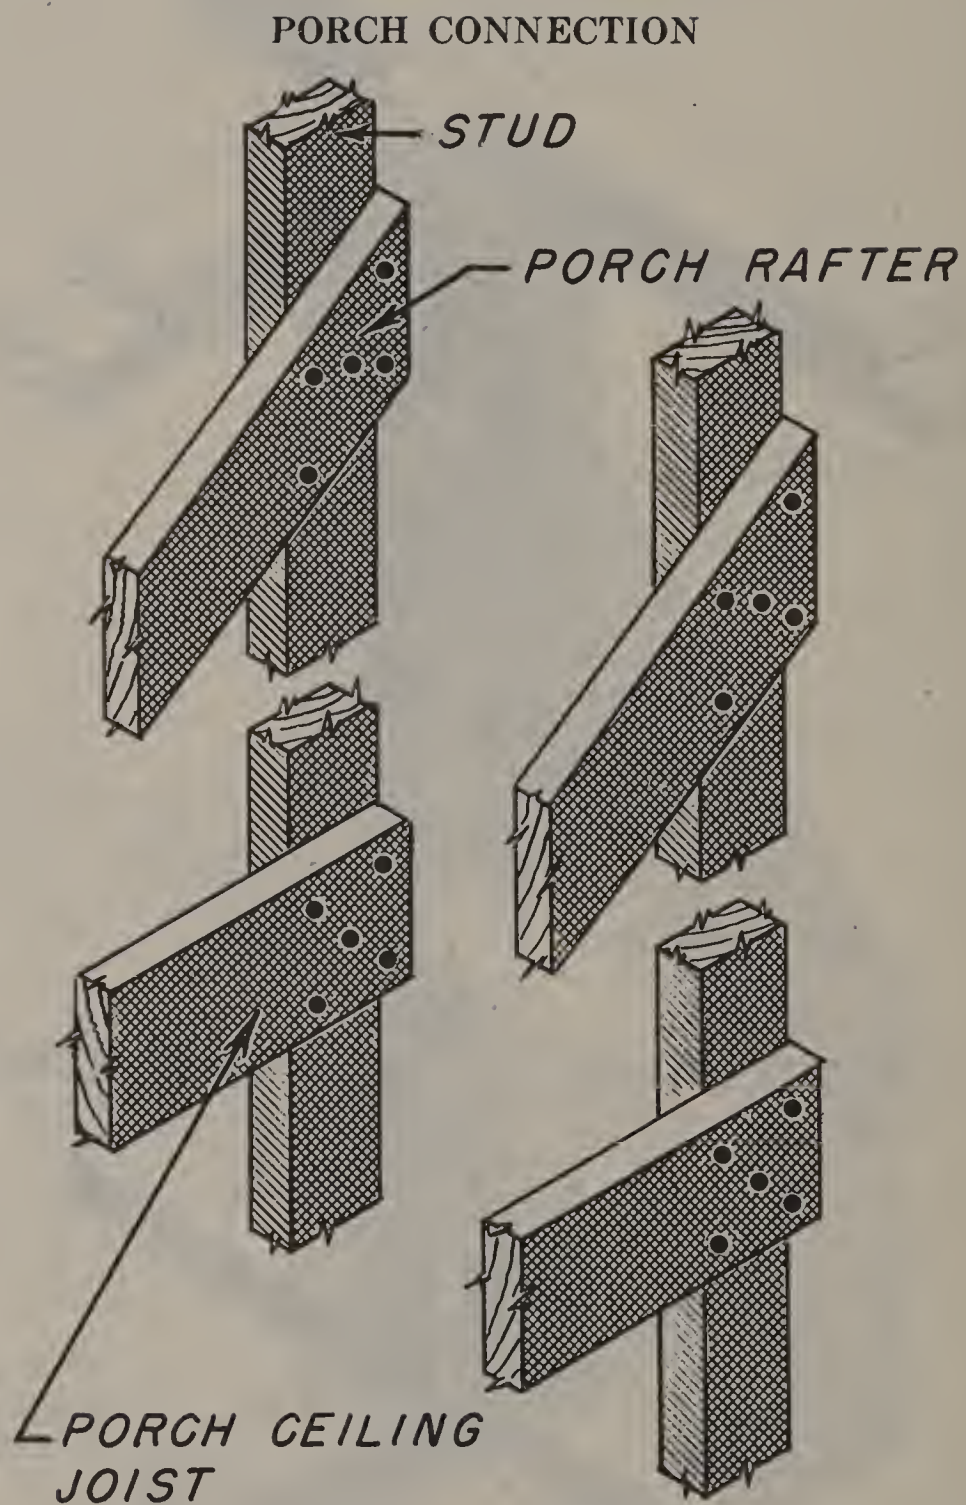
Connection of porch roof to house. Porch rafters and ceiling joists nailed to studs of the house with five tenpenny nails.
